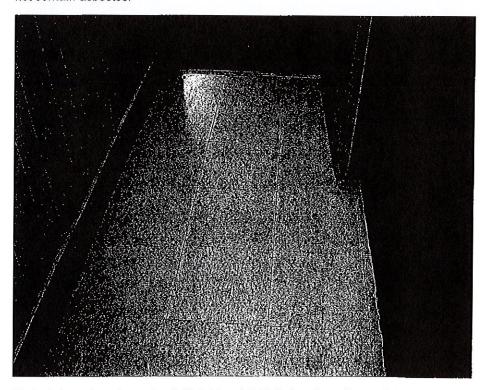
Location of samples S10, S11 and S12 (beige, floor tiles, main level, 2<sup>nd</sup> floor) for asbestos testing. These tiles were found to contain 20 to 25% Chrysotile asbestos.
